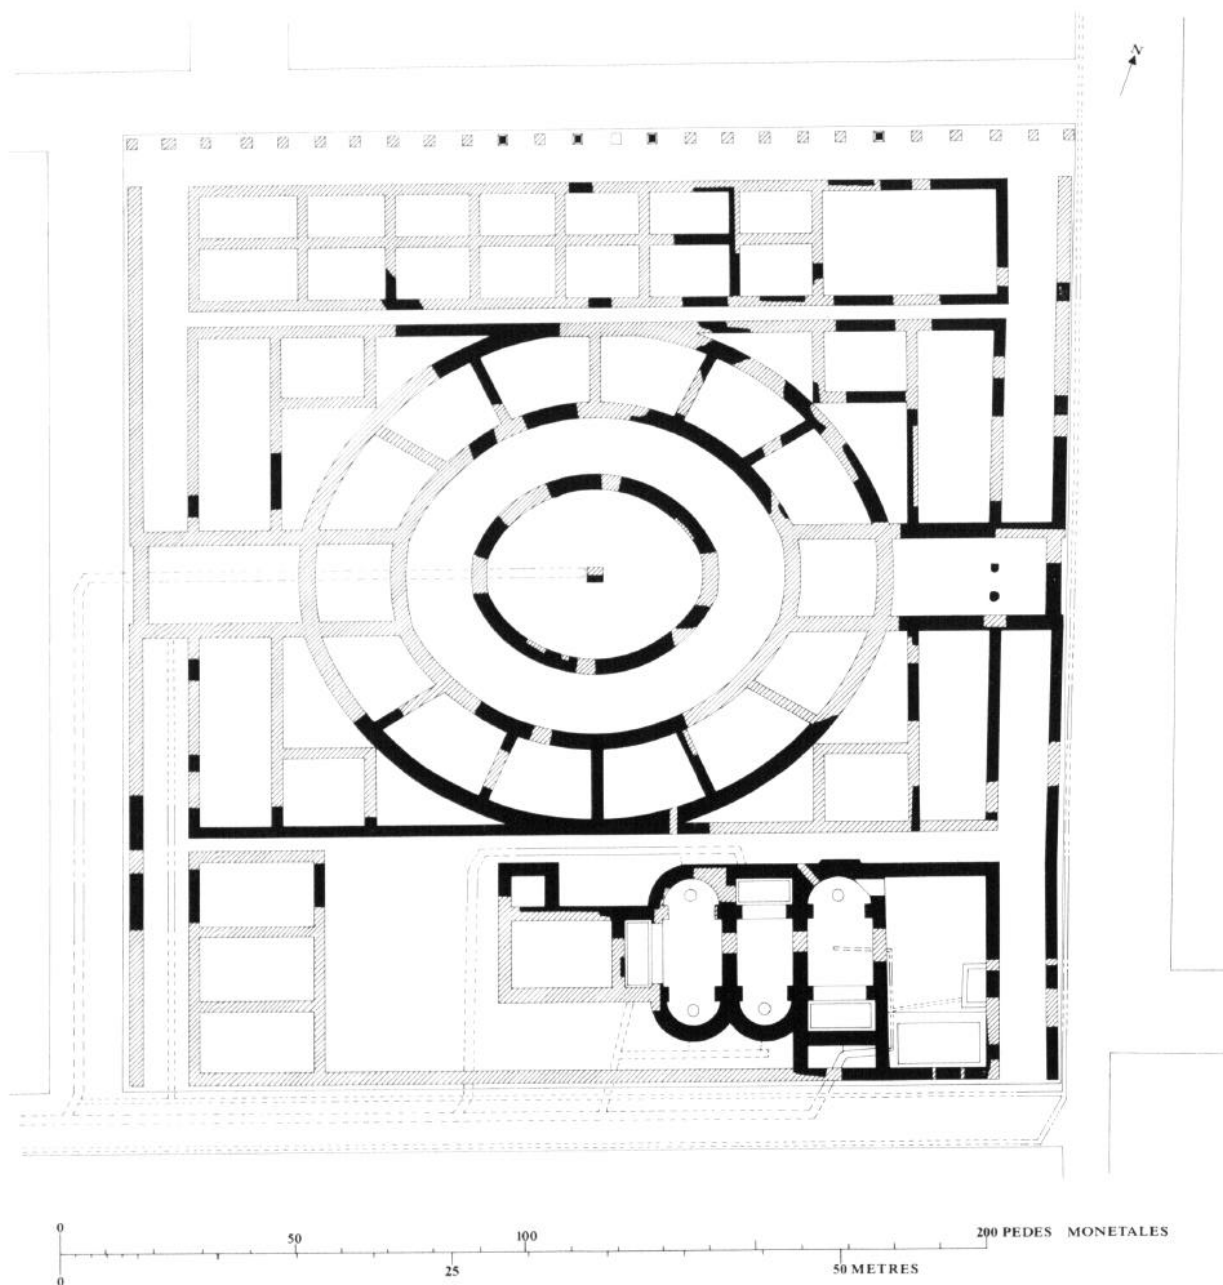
Restored plan of the Severan Elliptical Building and adjacent bath-building and tabernae; (solid = walling/foundation found, hatched = restored)
